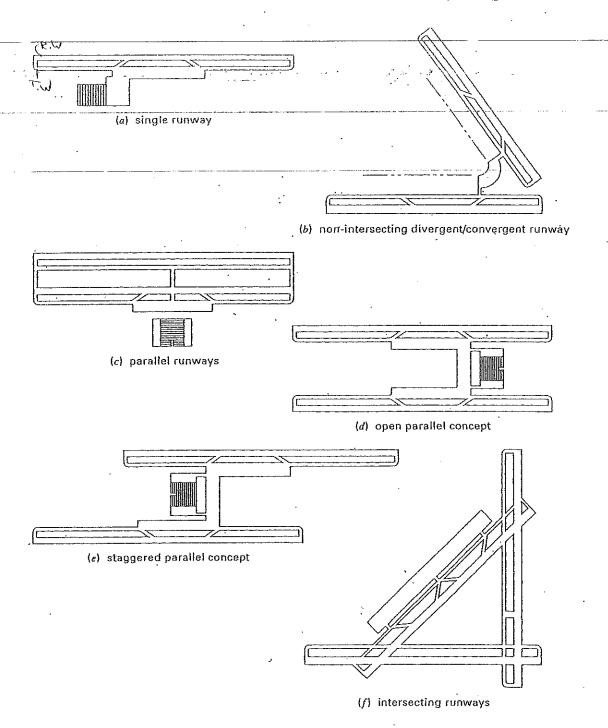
Typical airport configurations. (a) Single runway. (b) Nonintersecting divergent/convergent_runways_(c) Parallel runways_(d) Open parallel runways (e) Staggered parallel concept. (f) Intersecting runways.
